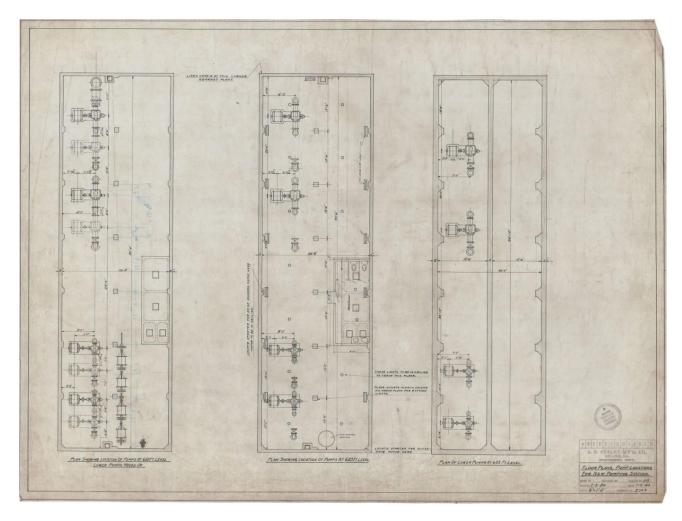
Floor Plans, Pump Locations For New Pumping Station (AES, Drawing No. 5309; 3 January 1920). Note that this set of plans does not illustrate the stairs from overhead, nor the location of the large windows flanking the 620' level (left and middle plans). The plans indicate a short flight of steps up into the men's toilet room. The stairs from above were modified from the original as designed plans, integrating a single flight from overhead onto a slightly raised landing at the level of the men's toilet room.
